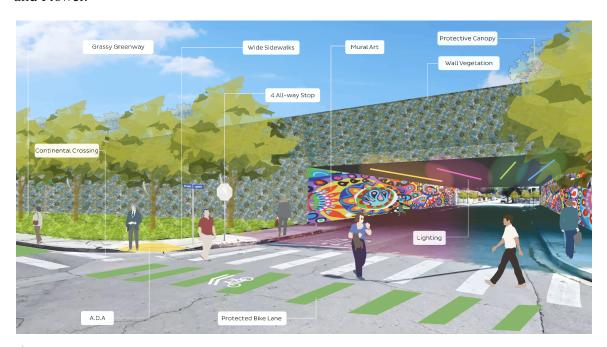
| Rendering of embankment and underpass activation. Looking west from Grand & 88th
